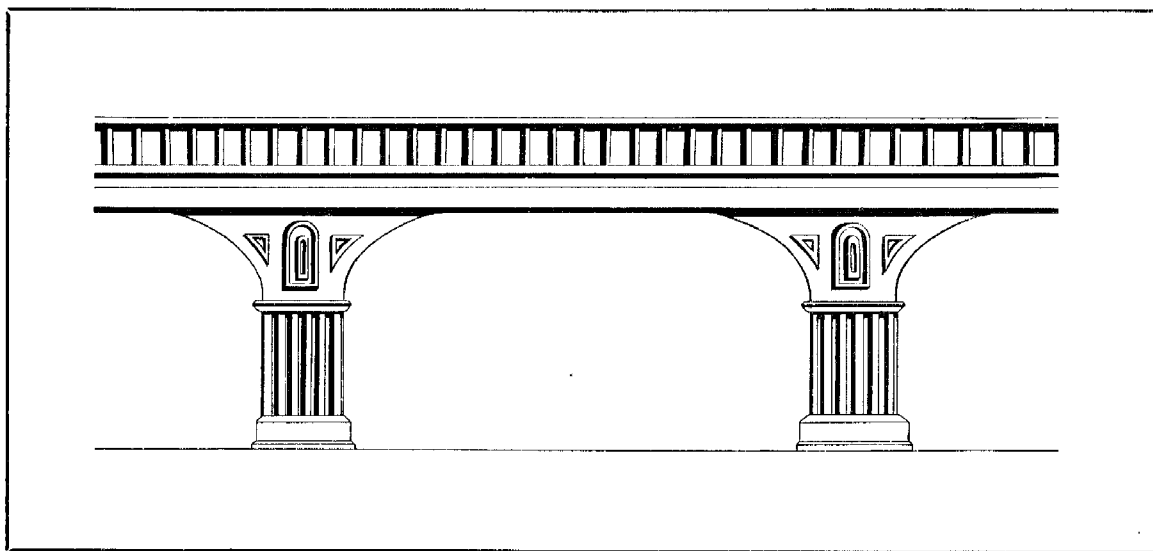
Suggested concrete-steel elevated structure for Los Angeles.
